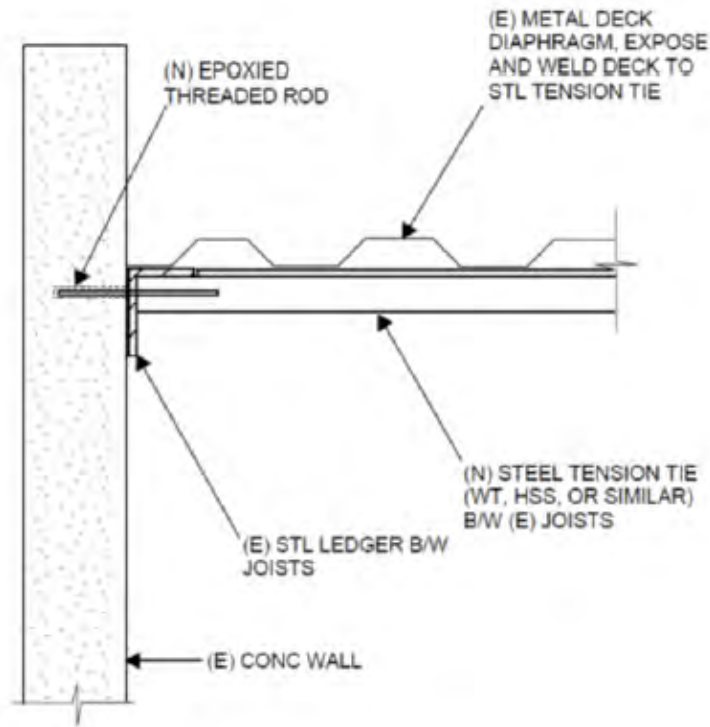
Addition of New Wall Anchorage Between Existing Joists to Enhance the Wall Anchorage Capacity
